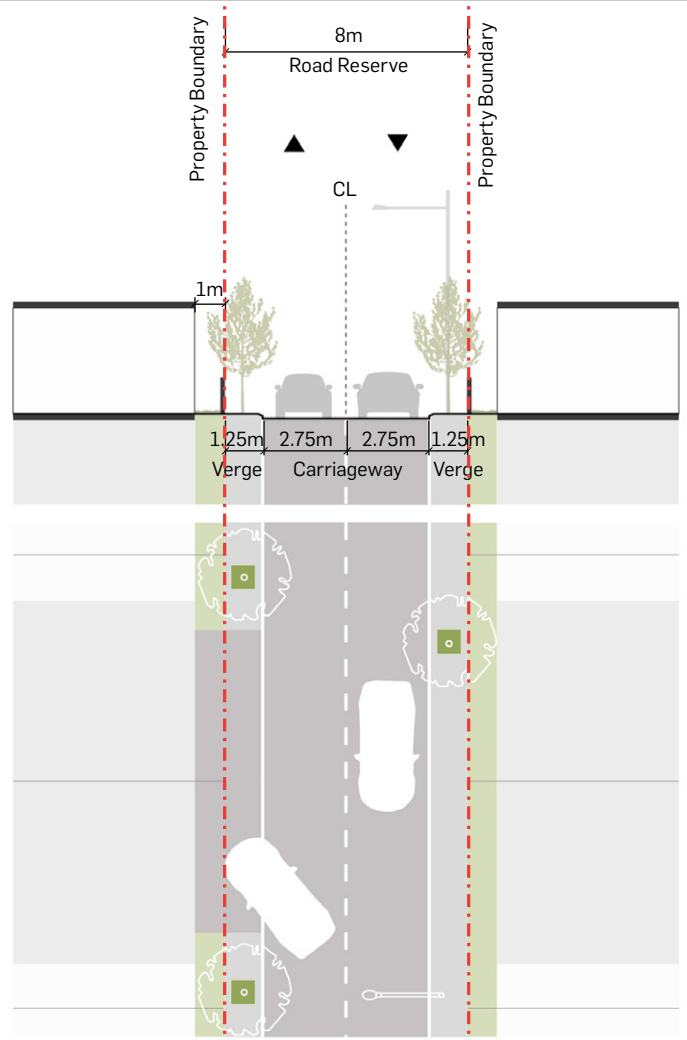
Indicative Street Section D-D' - Laneway - Type 8
